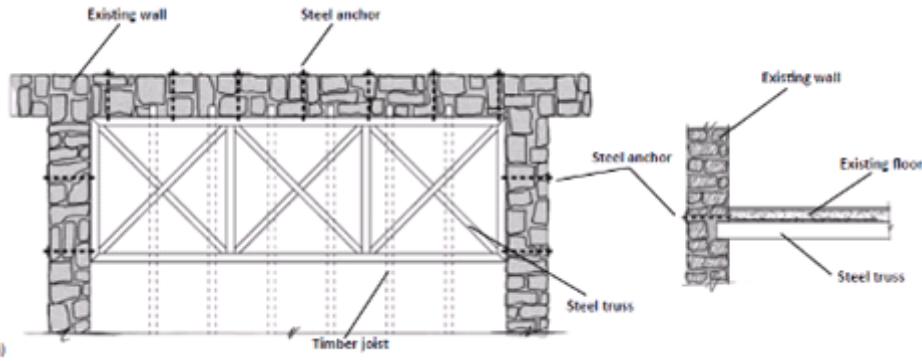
Retrofitting the floor and roof structures: a) diagonal braces (adapted from: Tomazevic 1999)
